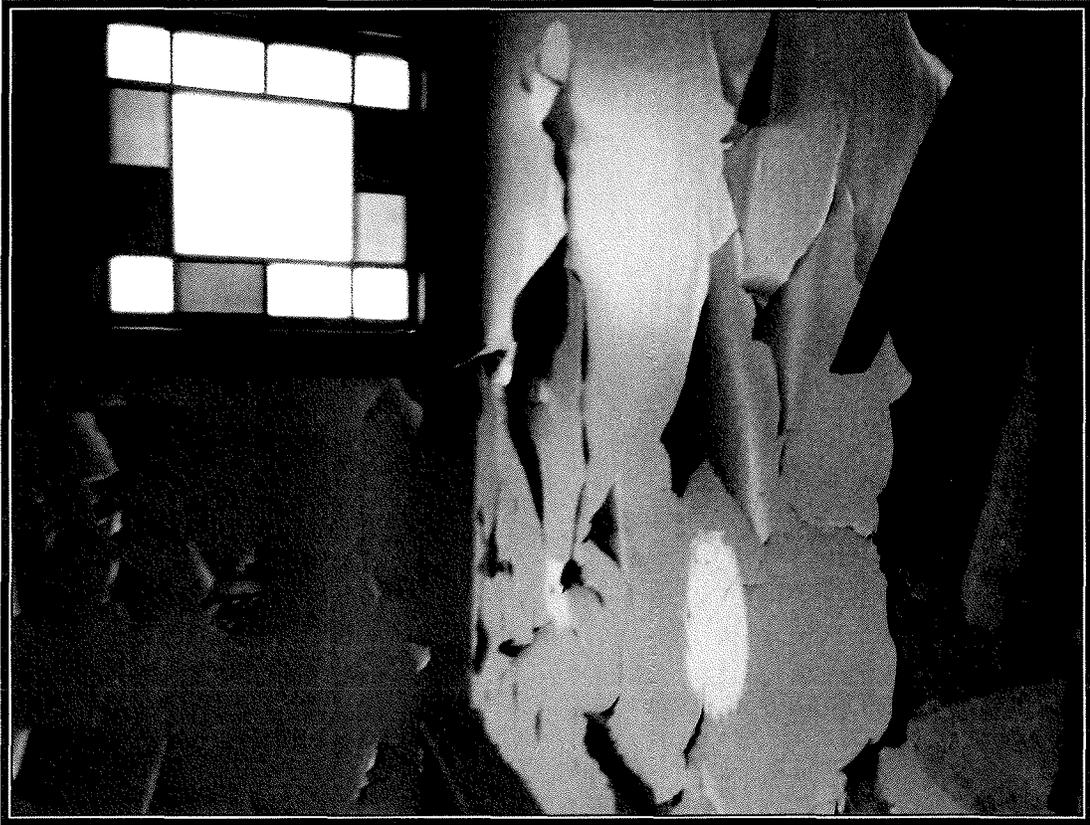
Severely deteriorated ceiling with missing plaster creating gaps into the joist bays creating a pathway for fire to spread at an accelerated rate through the building.
